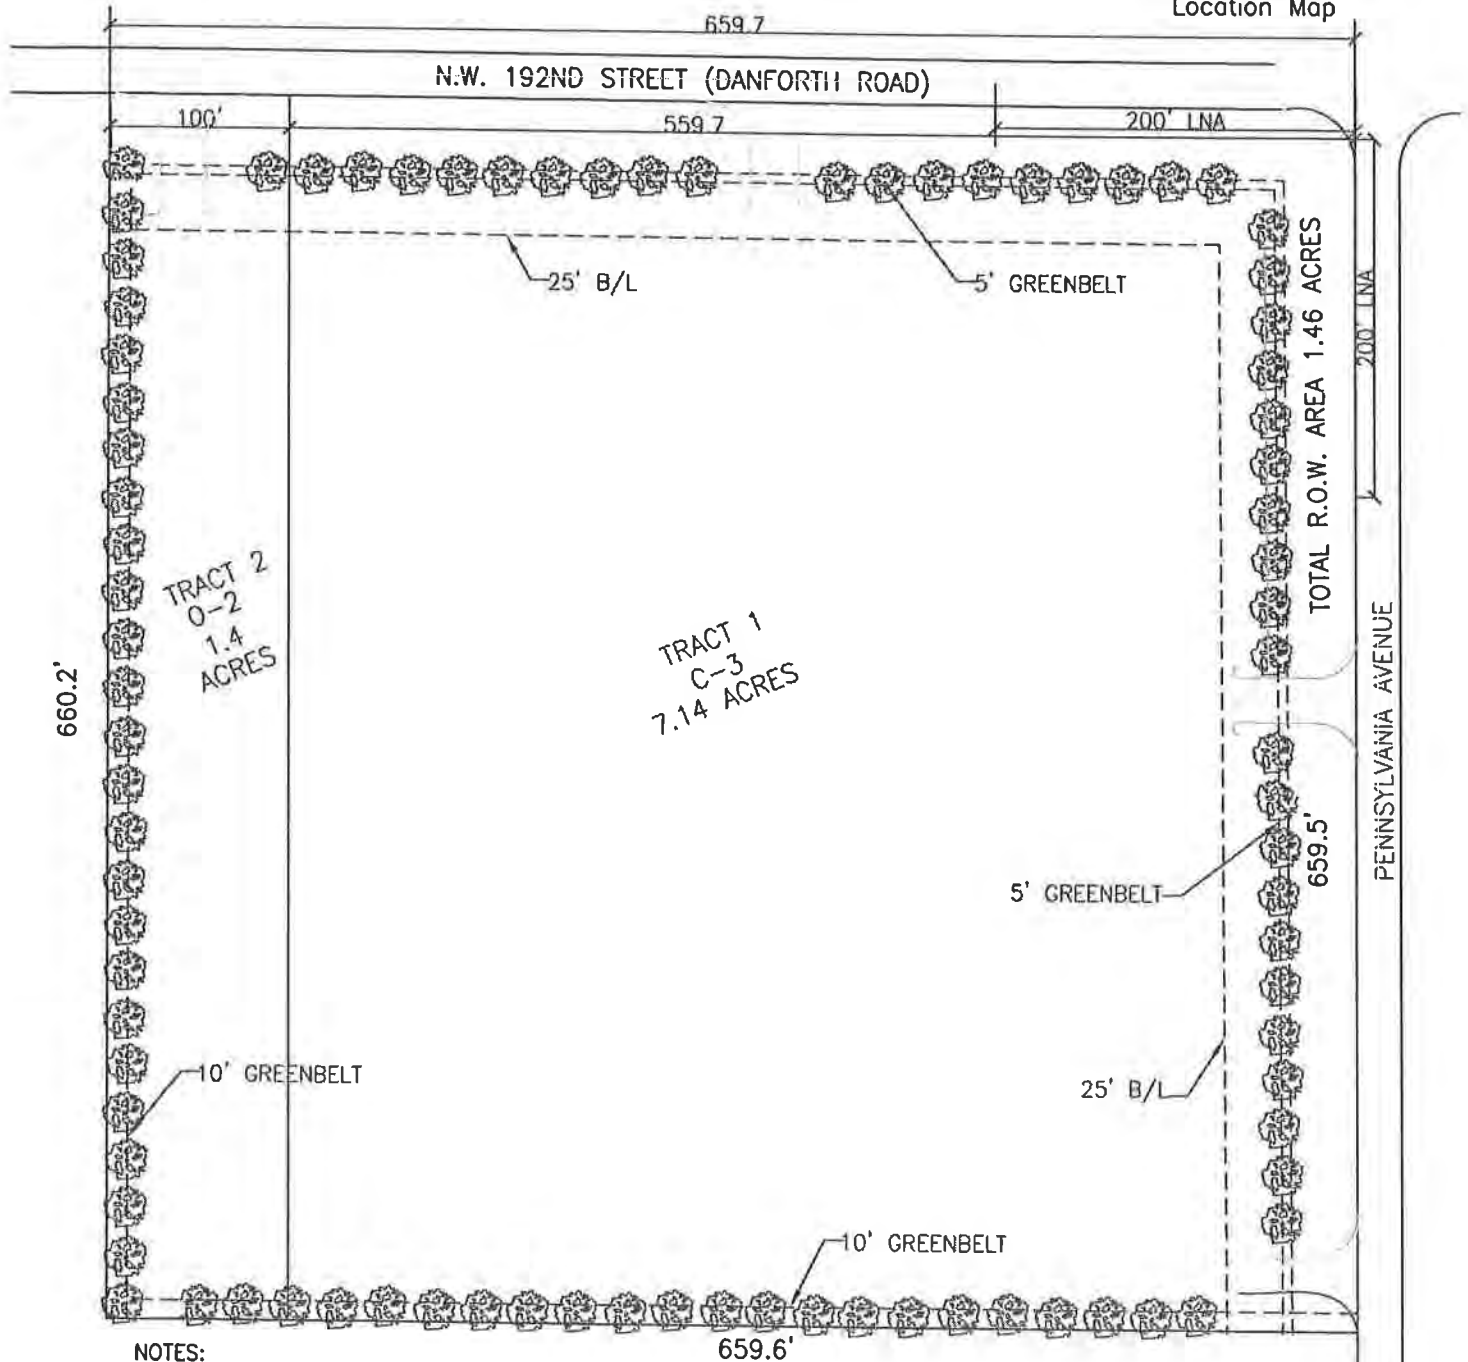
Exhibit D: Conceptual Plan (Improvements shown are conceptual only. Final design will be determined at the building permit stage.)
